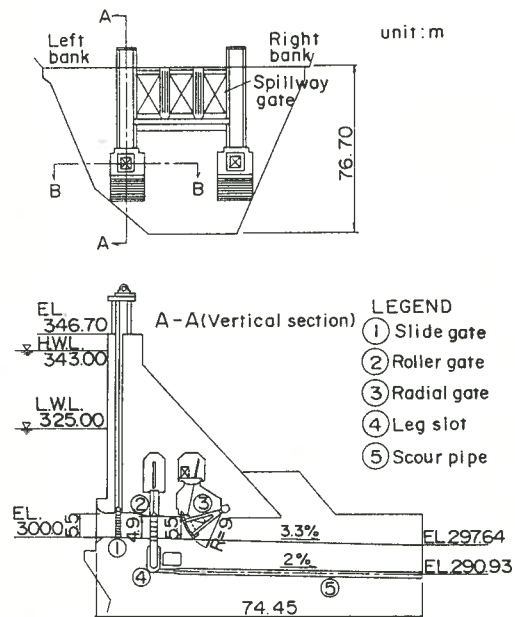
Dashidaira Dam - Typical Cross Section Sediment Dislodging Facilities
